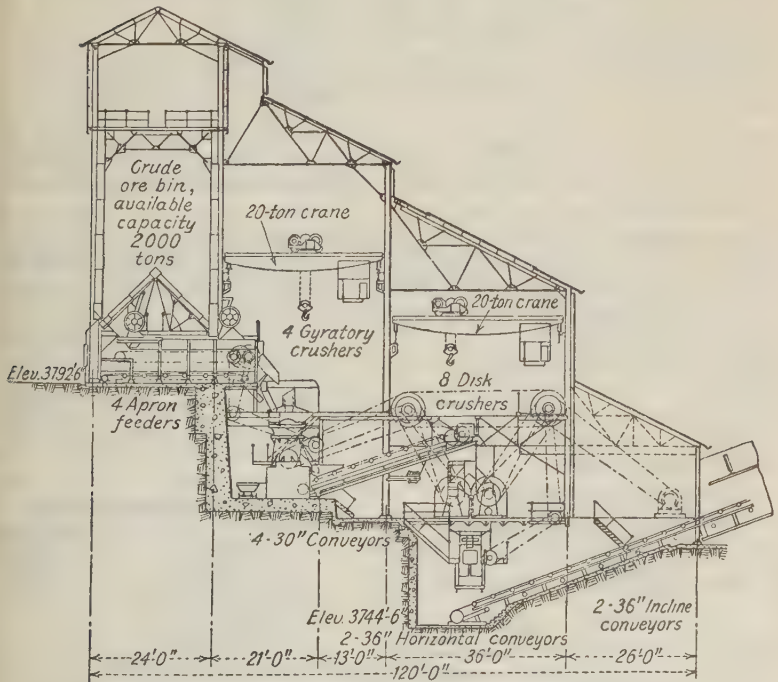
Section of coarse-crushing plant at Inspiration.
